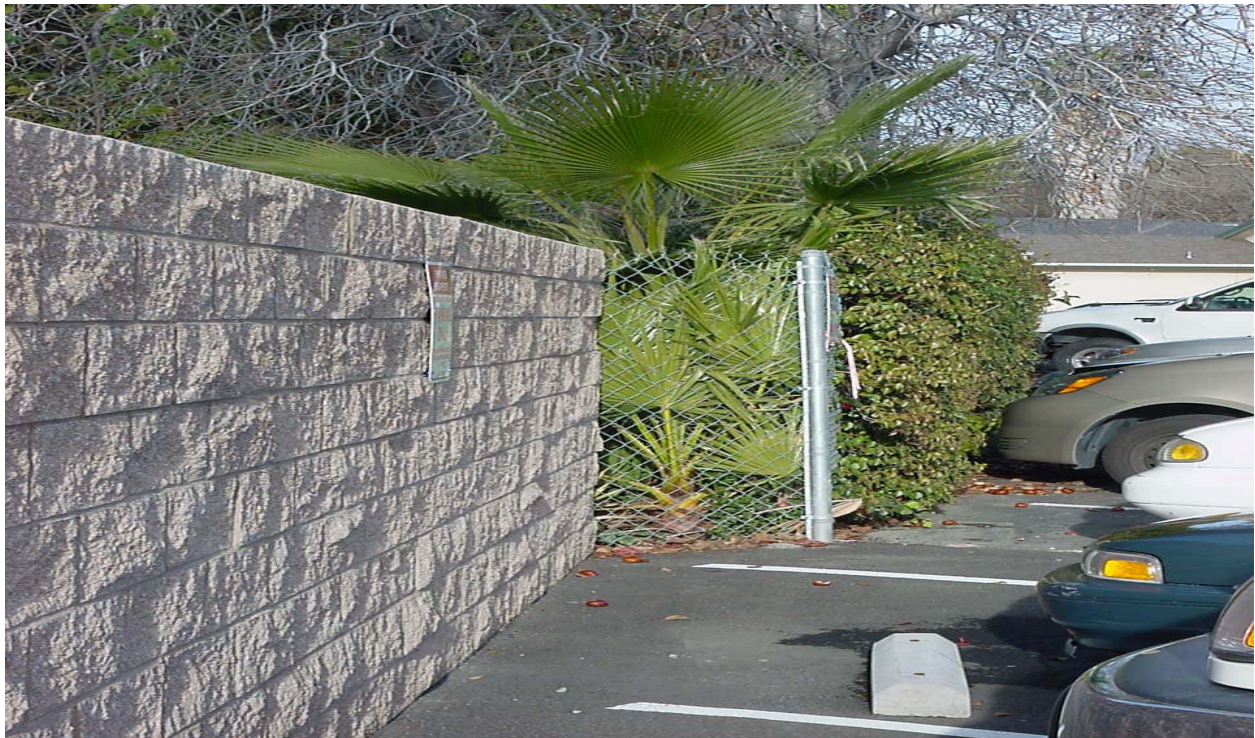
, Transition from Masonry Wall to Vine Covered Chain Link Fence
